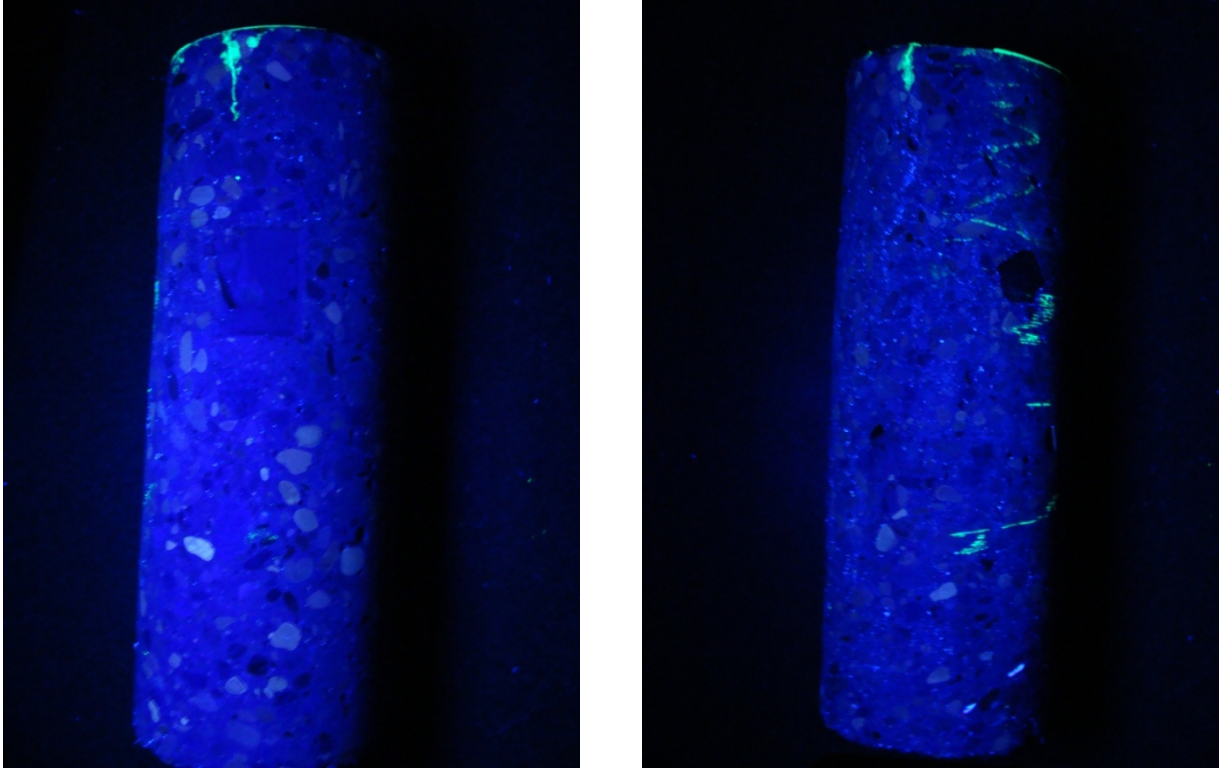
Core SLS3 (left) west elevation; (right) east elevation
